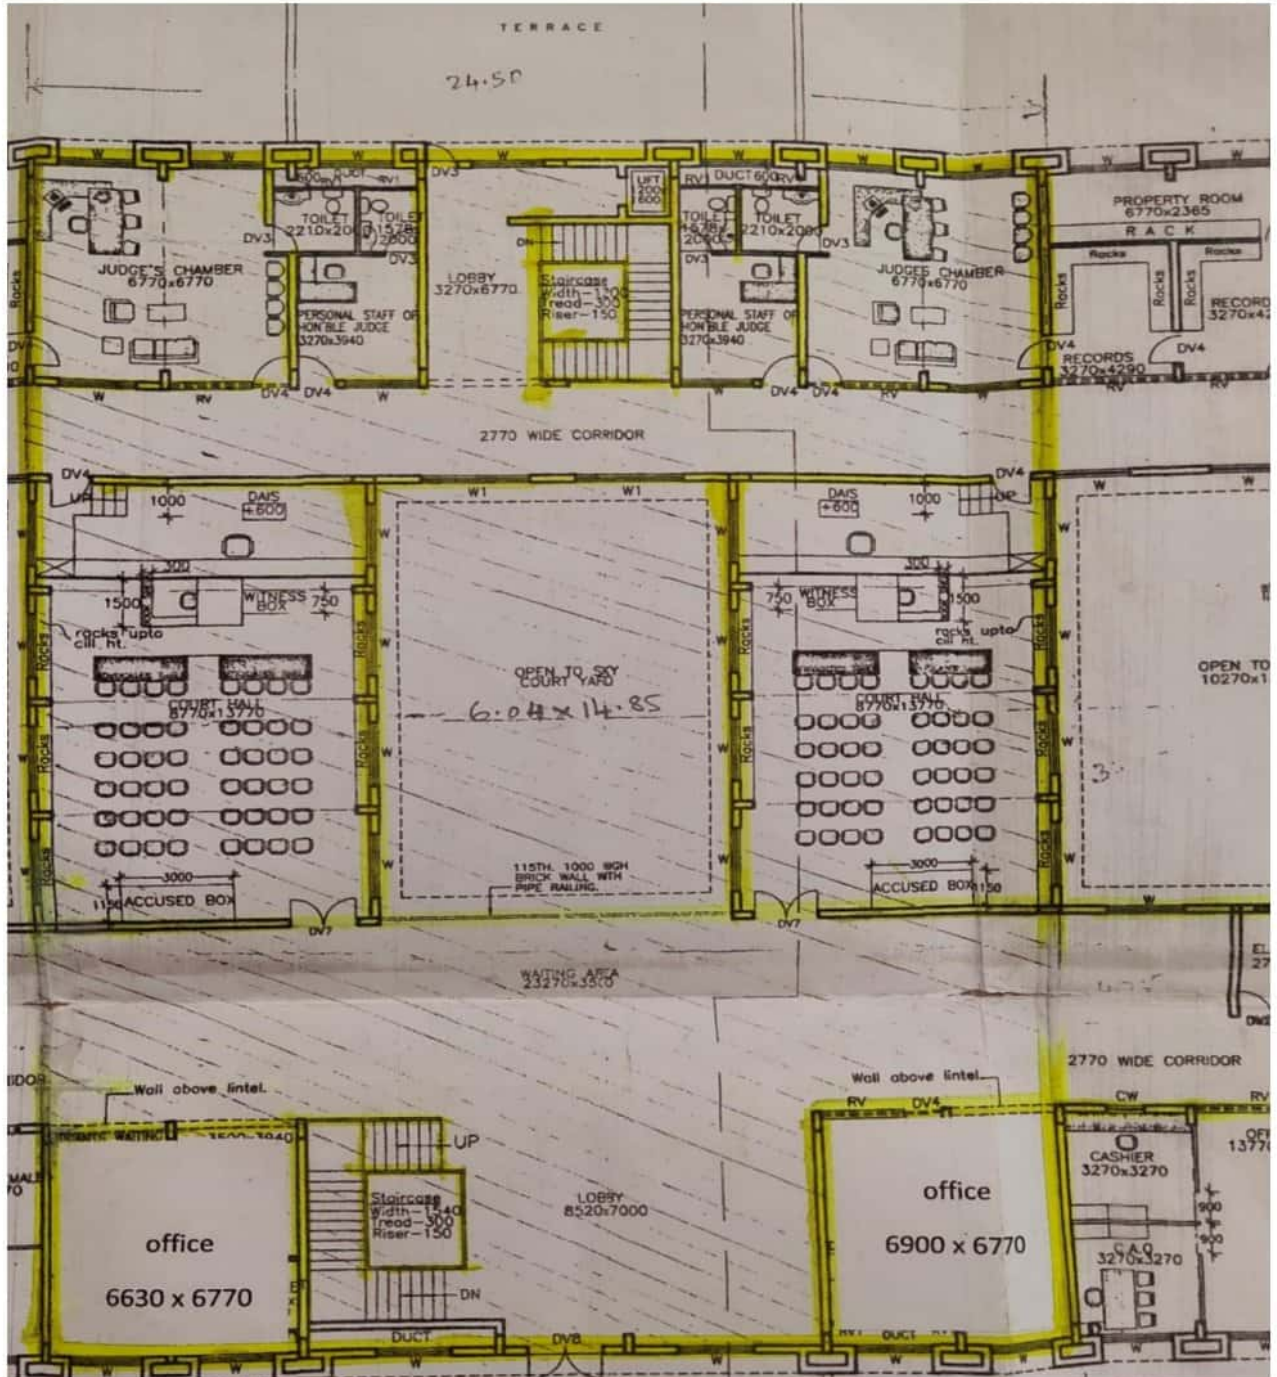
PLAN FOR CONSTRUCTION OF 4th ADDITIONAL DISTRICT AND ADDITIONAL COURT AT TUMKUR (to sit at Madhugiri) IN TUMKUR DISTRICT
